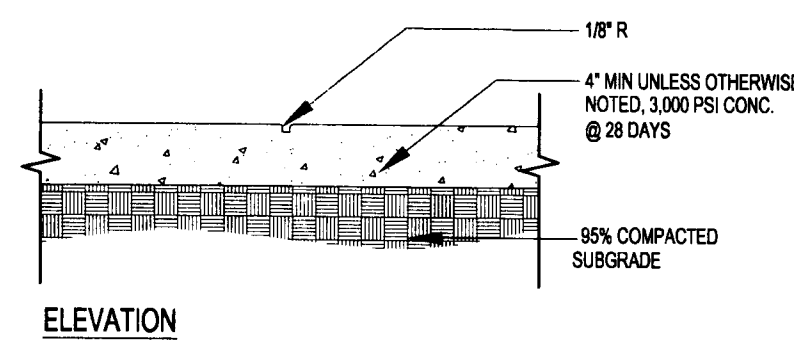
DETAILS SHOWING EXPANSION JOINTS IN CONCRETE SIDEWALK
